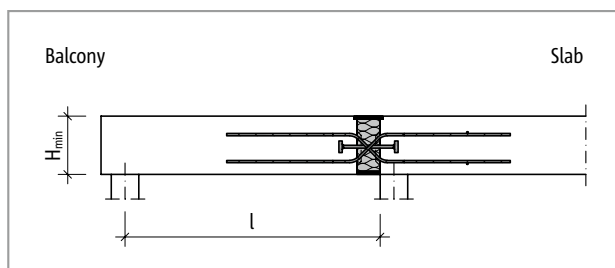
Schöck Isokorb® T type Q-P-VV: Static system
